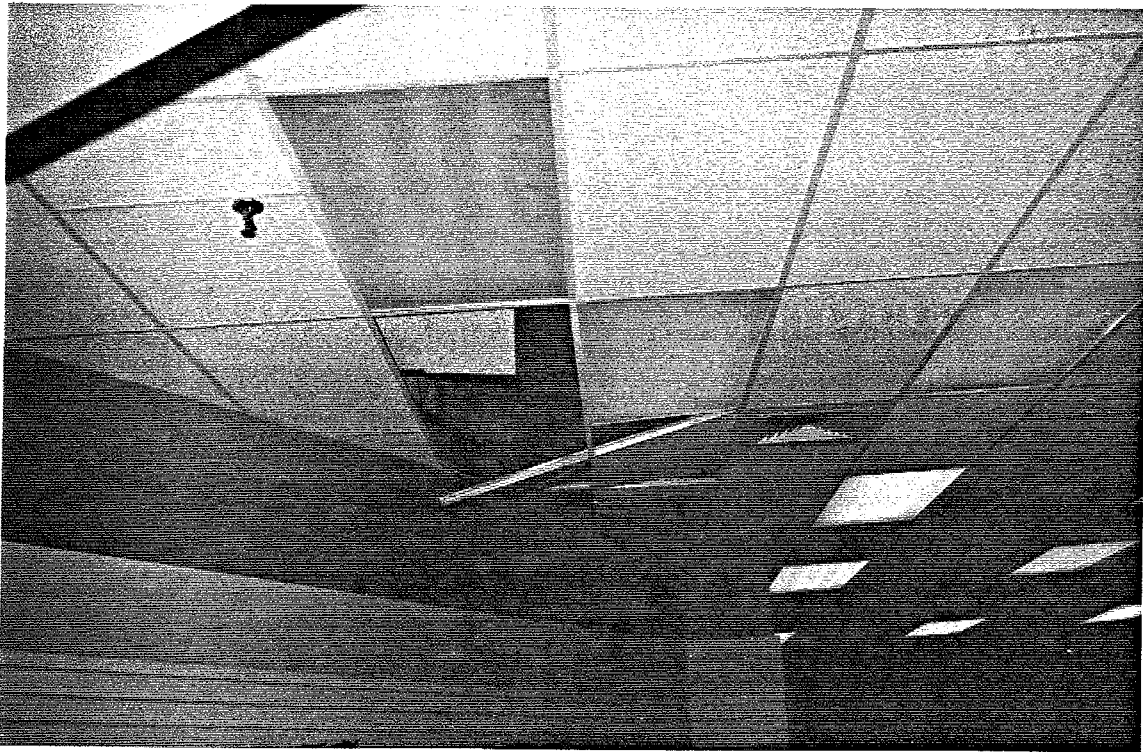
Damaged ceiling tiles due to fallen masonry blocks at Kébec Disque store in Place du Royaume Shopping Plaza.
